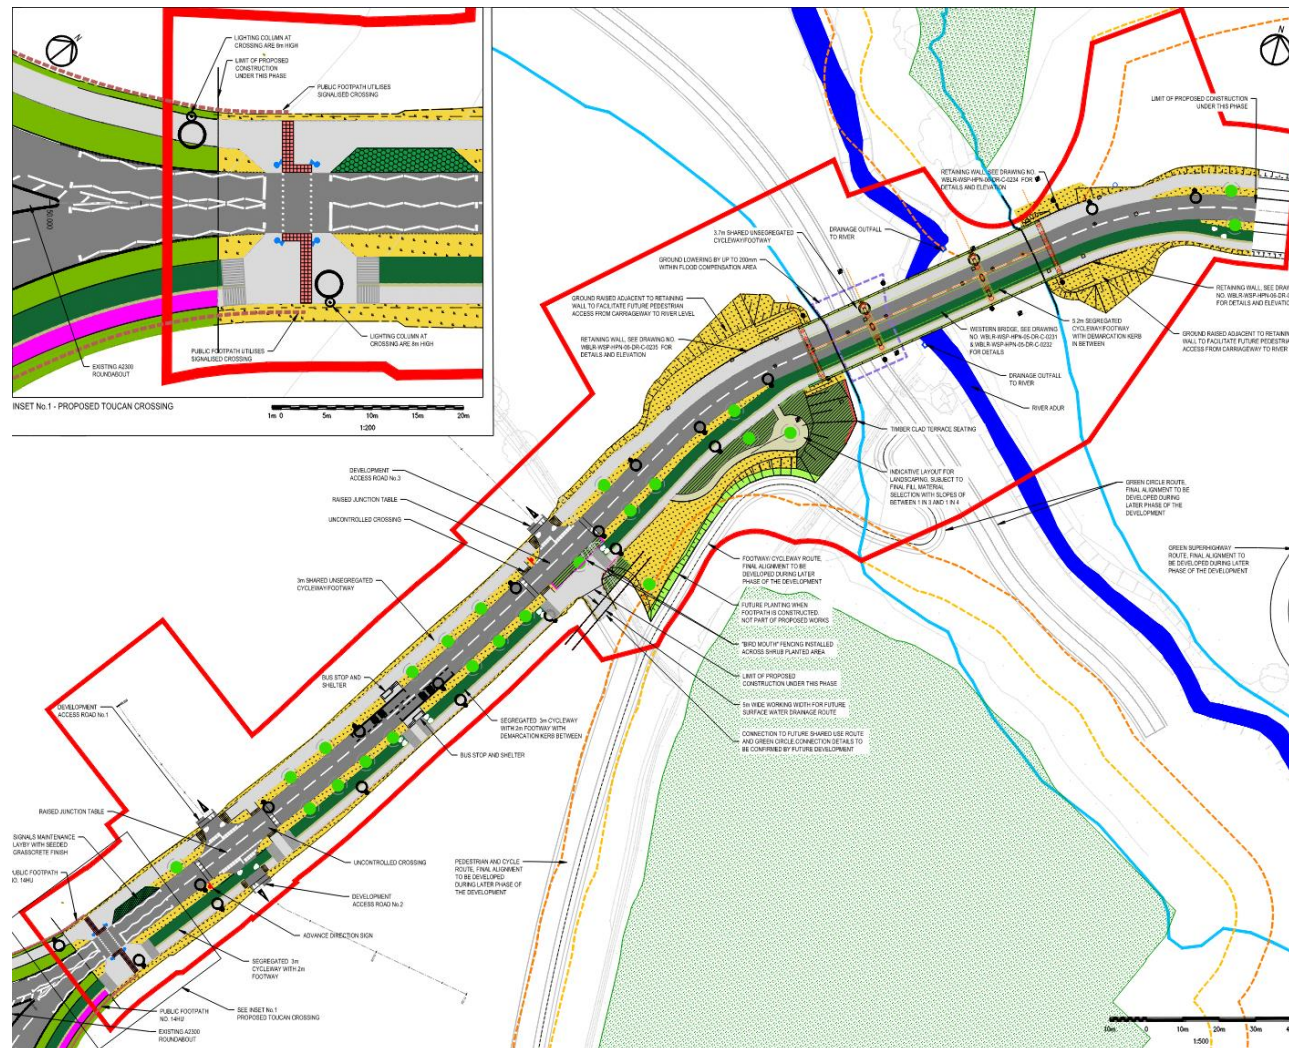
General Plan Layout - see drawing WBLR-WSP-HPN-04-DR-C-0223
